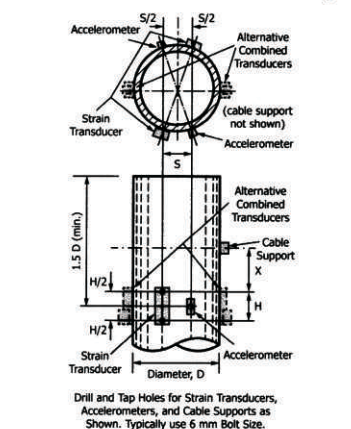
Typical Arrangement for Attaching Transducers to Pipe Piles
